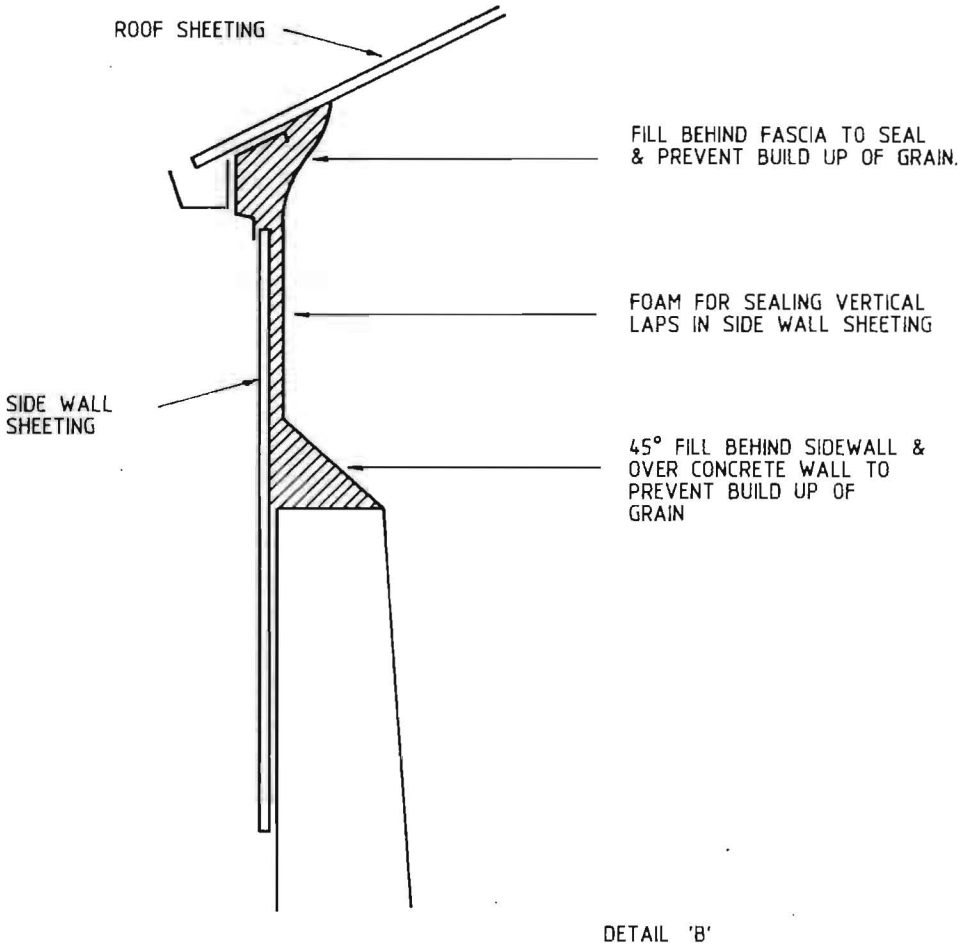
DETAIL OF USE OF FOAM POLYURETHANE TO FILL WALL - TO - ROOF JOIN IN A STEEL - CLAD HORIZONTAL STORAGE.
